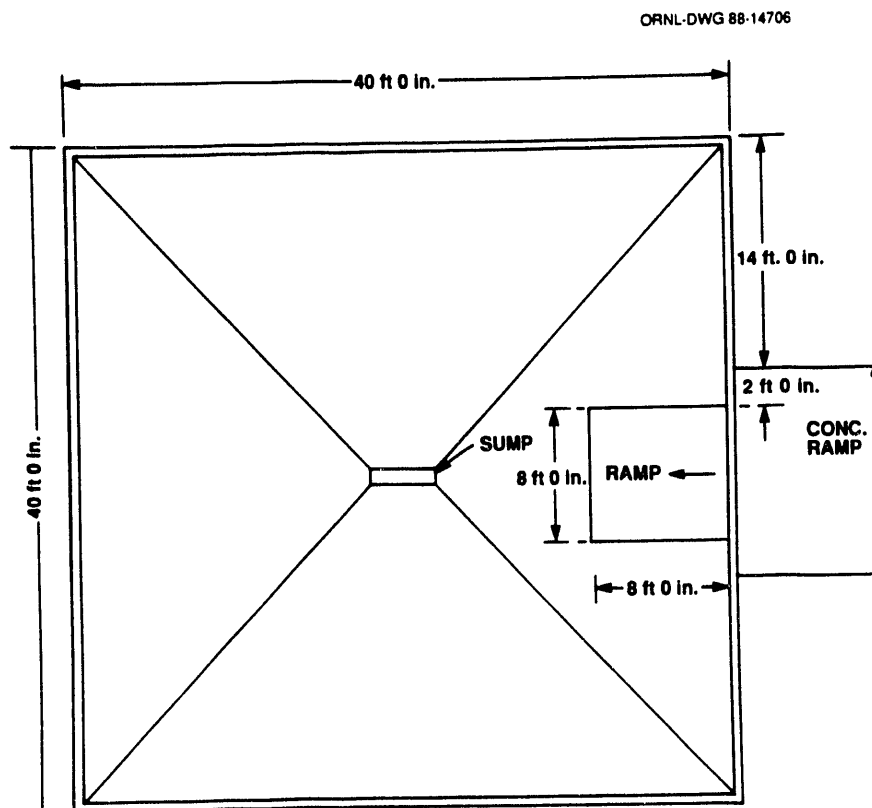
Layout of the Mixed Hazardous Waste Storage Pad (Building 7507W).
